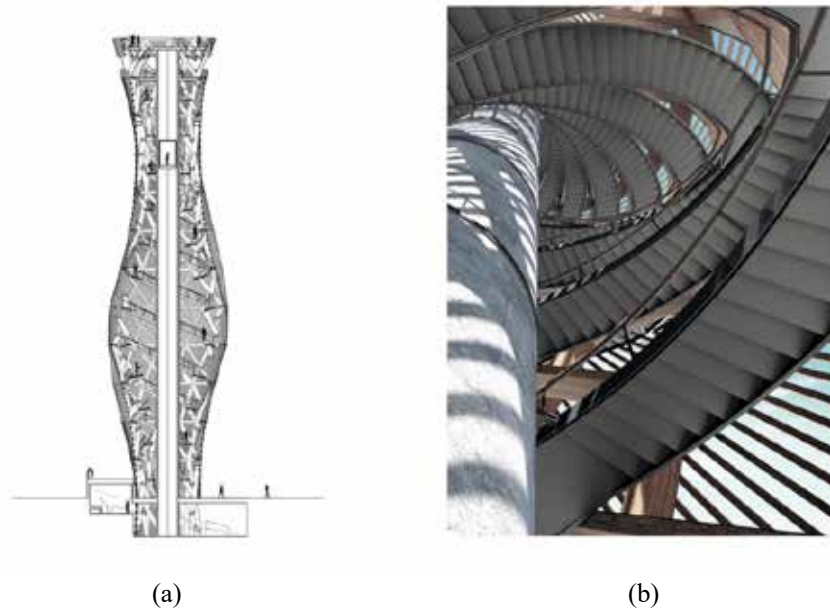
Twist Light Tower showing interior of tower: (a) section showing concrete elevator core and spiral stair; (b) interior view looking up through stair and concrete core
